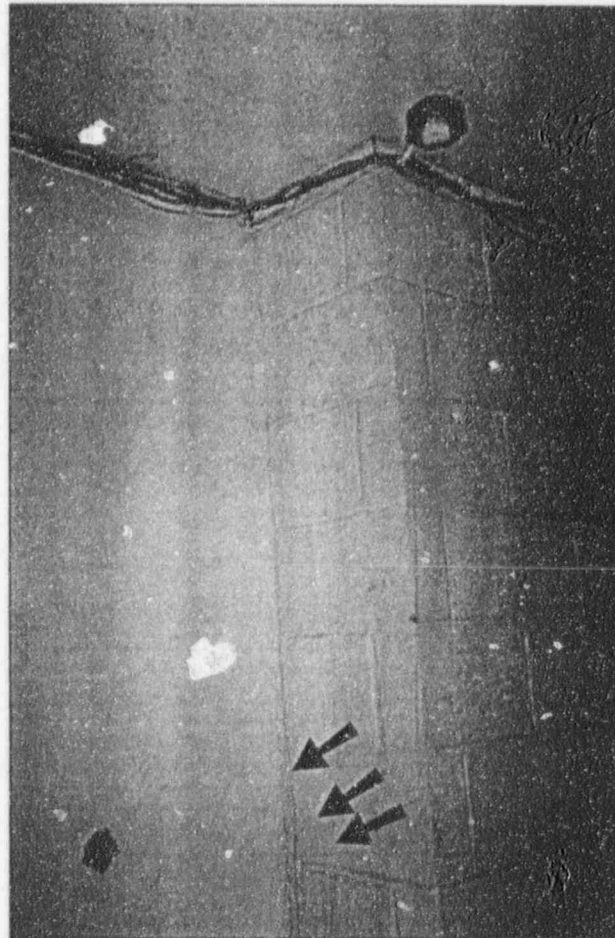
No ceiling tile water damage but evidence of fluid on the wall
